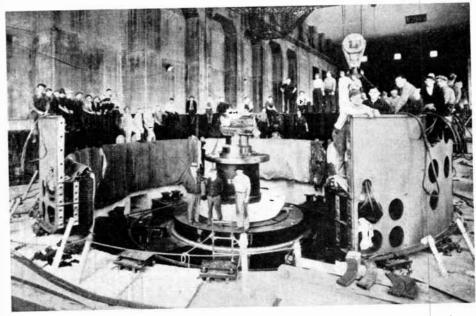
Installing the first waterwheel-driven generator at Bonneville Dam, showing the lower bearing bracket, shaft, thrust bearings, and five sections of the wound stationary armature in place
